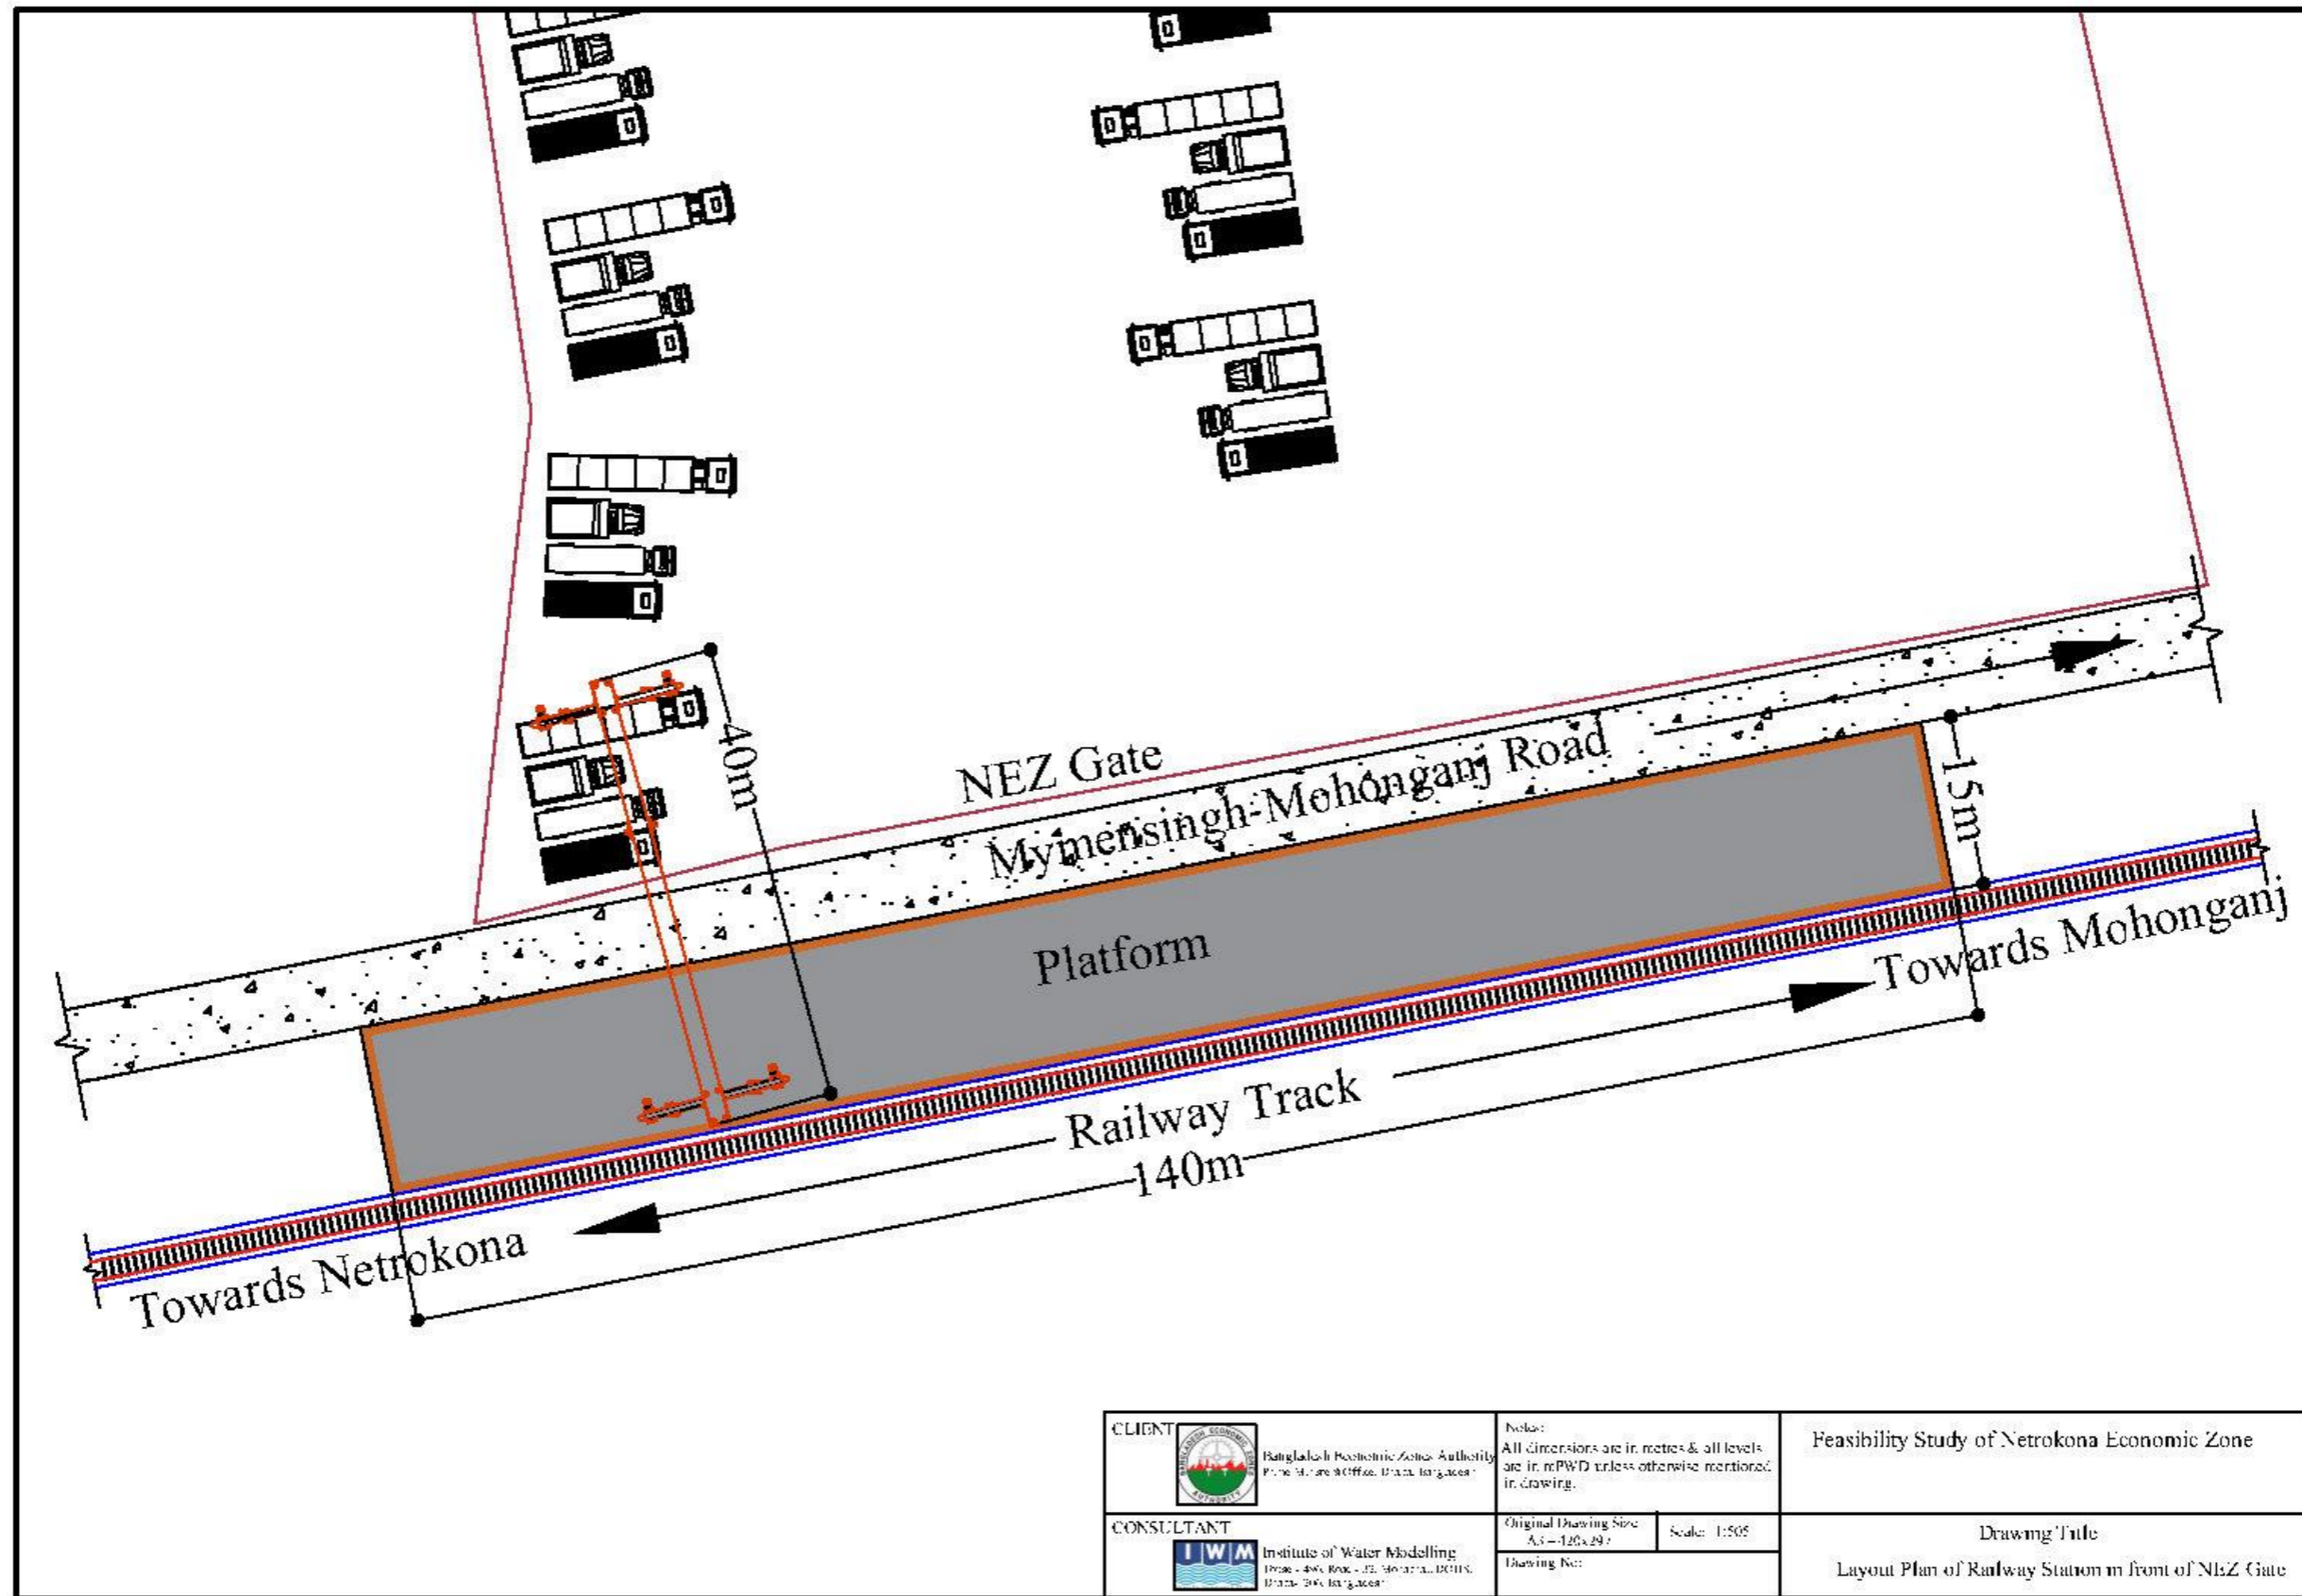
Layout Plan of Proposed Railway Station in front of NEZ Gate
